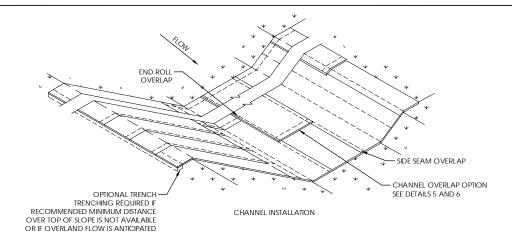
OPTION 1 CHANNEL INSTALLATION
